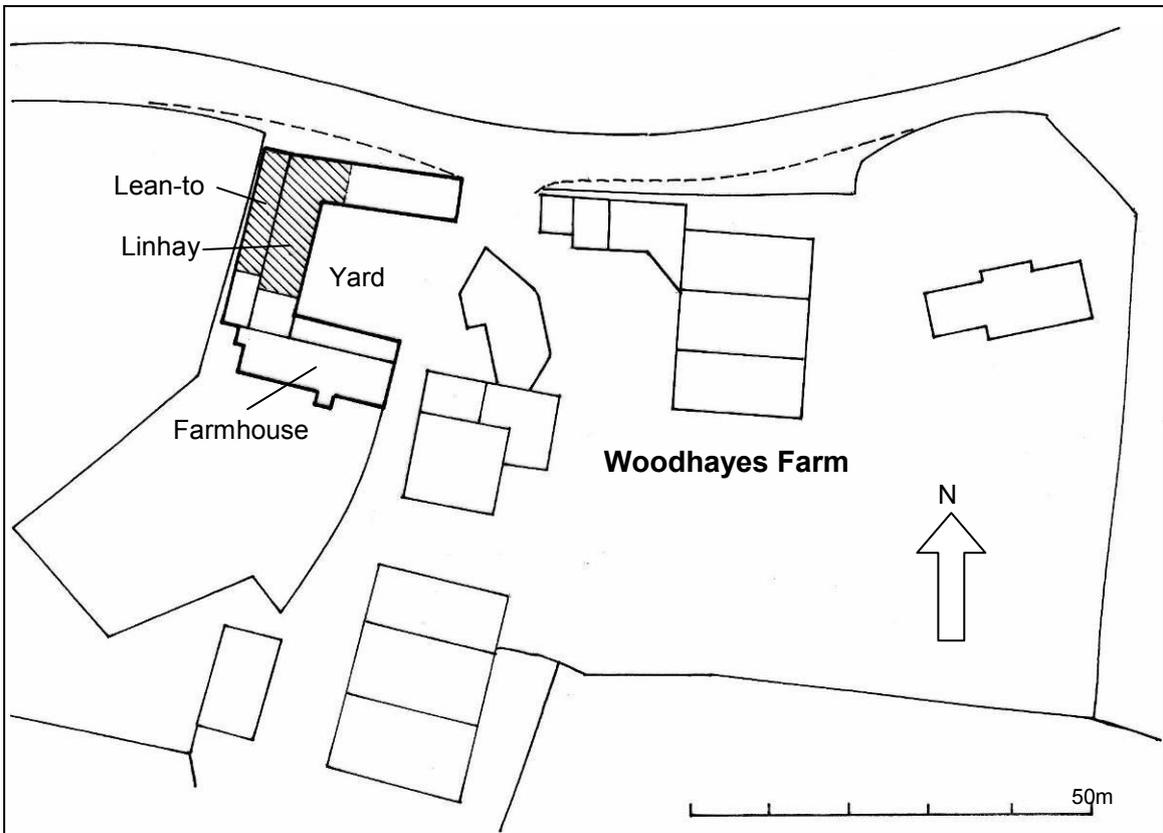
Woodhayes Farm, Clyst Hydon. Site plan, with lincay shown shaded
